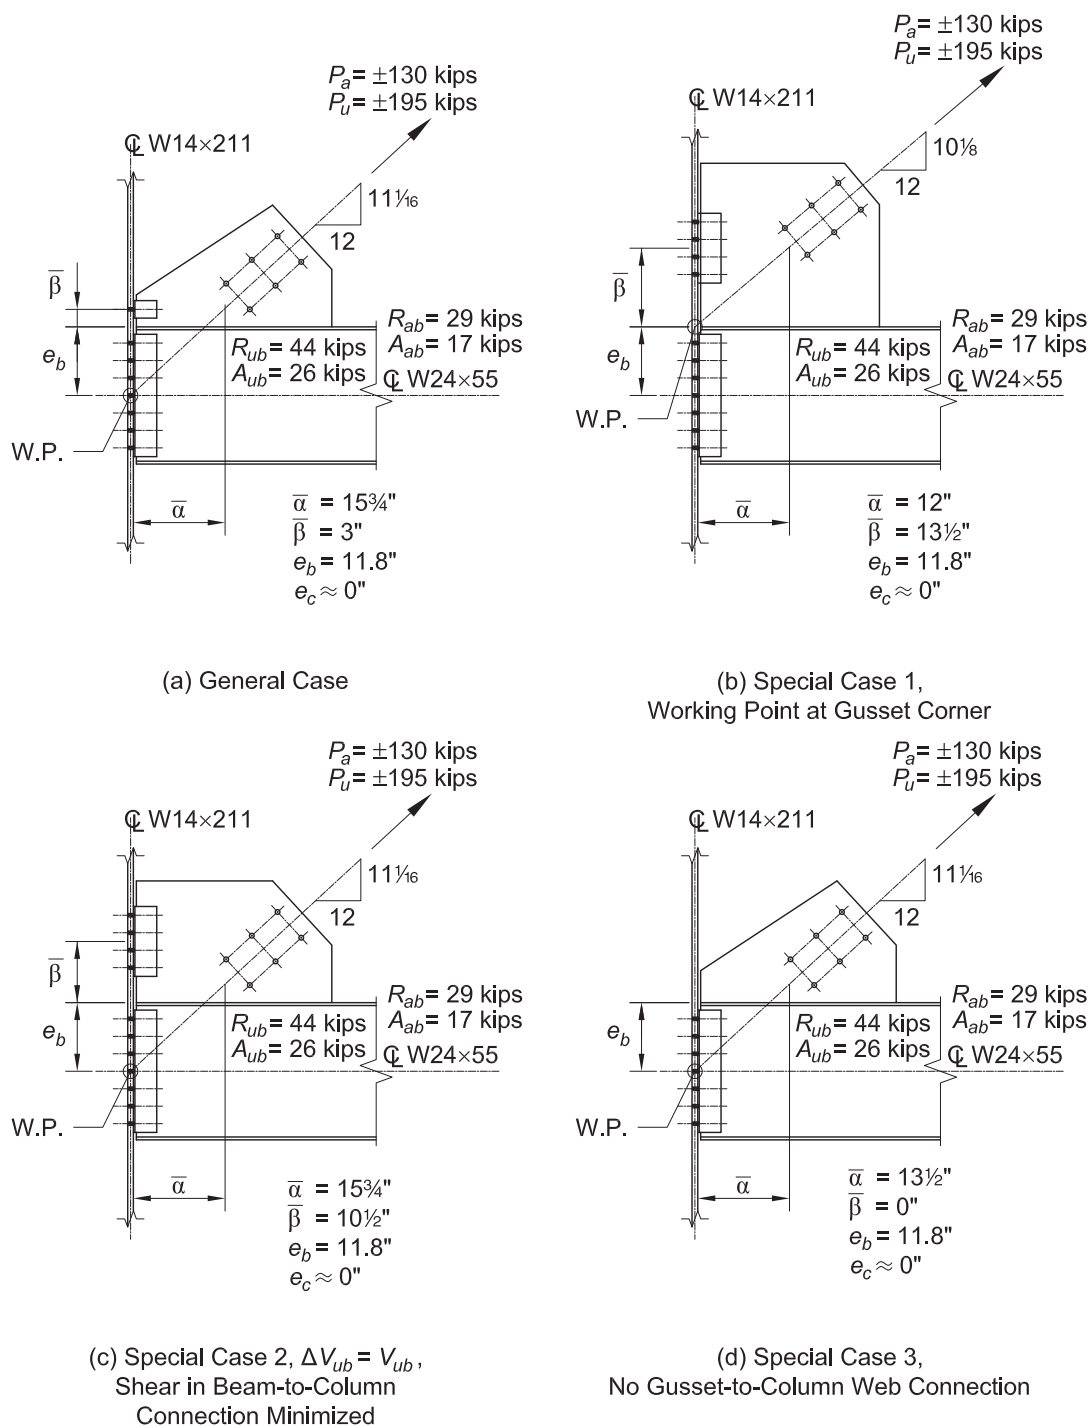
Bracing connection configurations for Example II.C-3.
